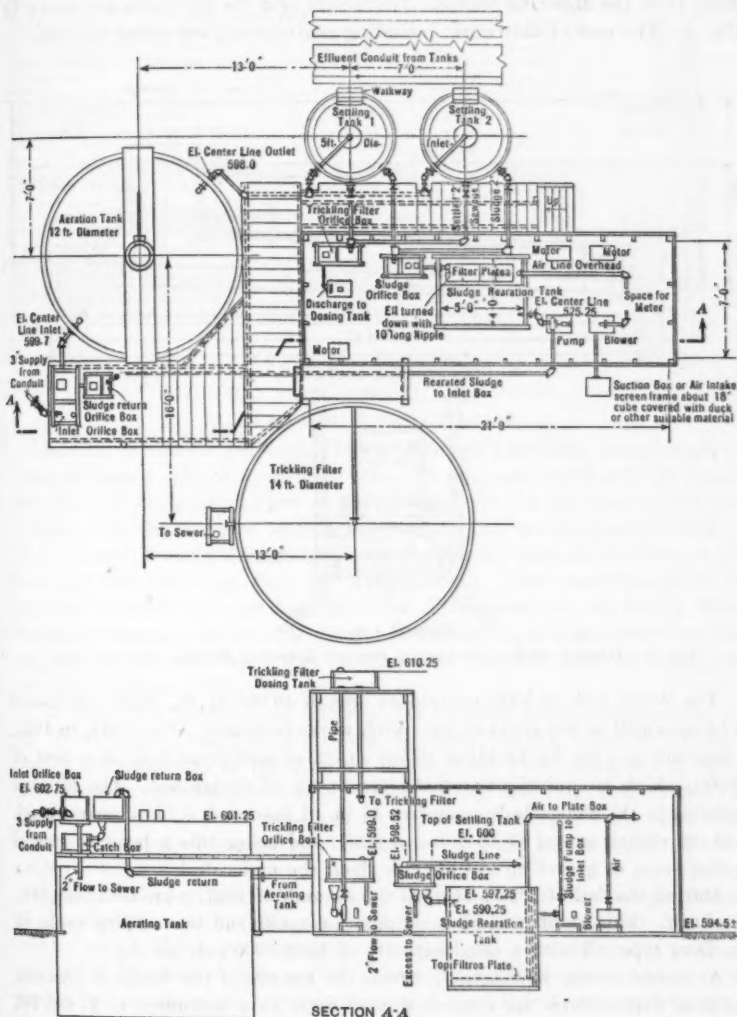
GENERAL PLAN, TESTING STATION, DECATUR, ILL.
